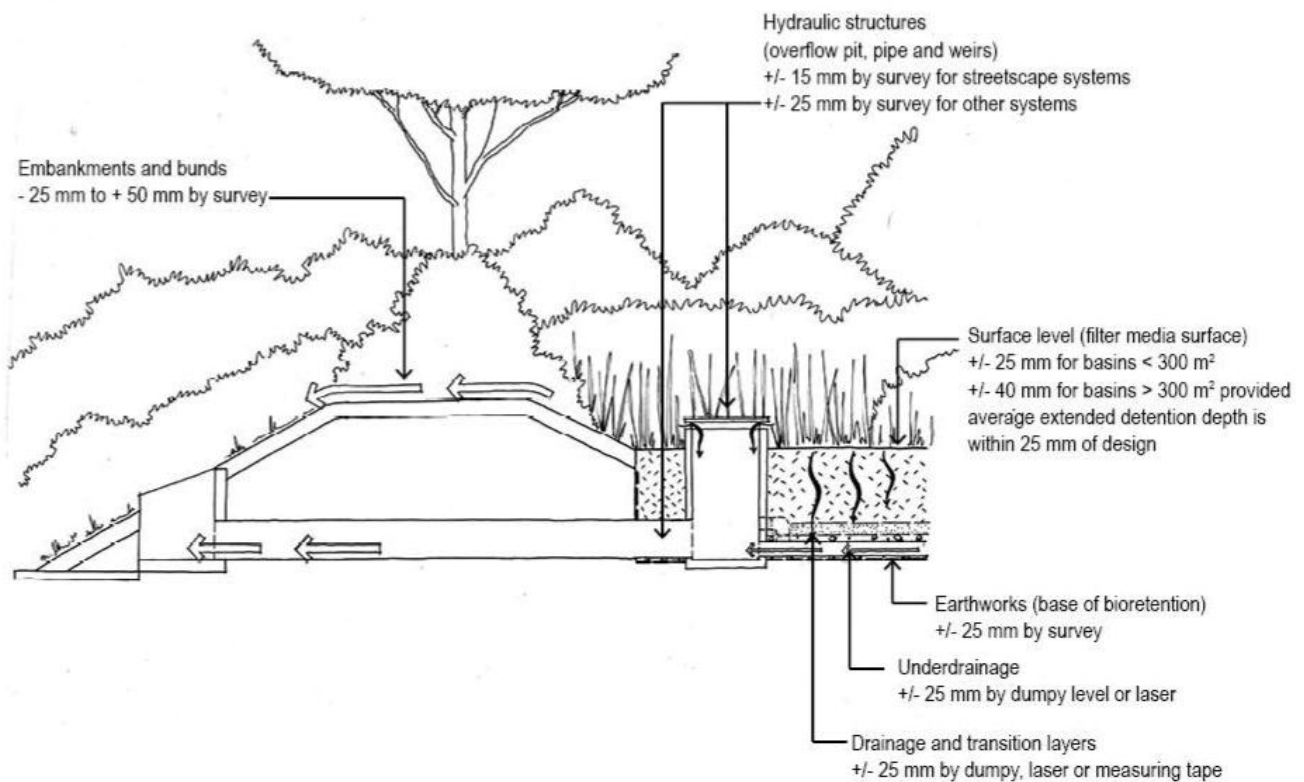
Typical bioretention system cross-section showing construction tolerances and survey method.
